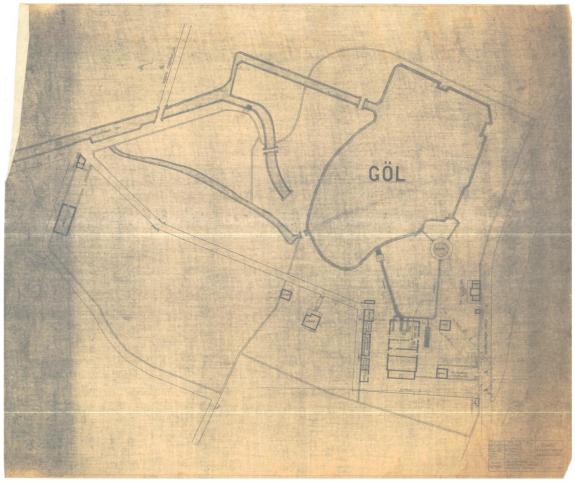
Archive document of Halkapınar Water Pump Station (Site Plan in 1958)
